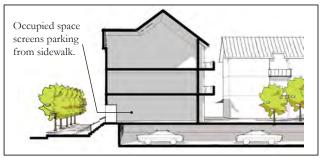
Where enclosed parking is at ground level, it should be fronted or wrapped with uses that can be occupied such as lobbies and living space when possible.
